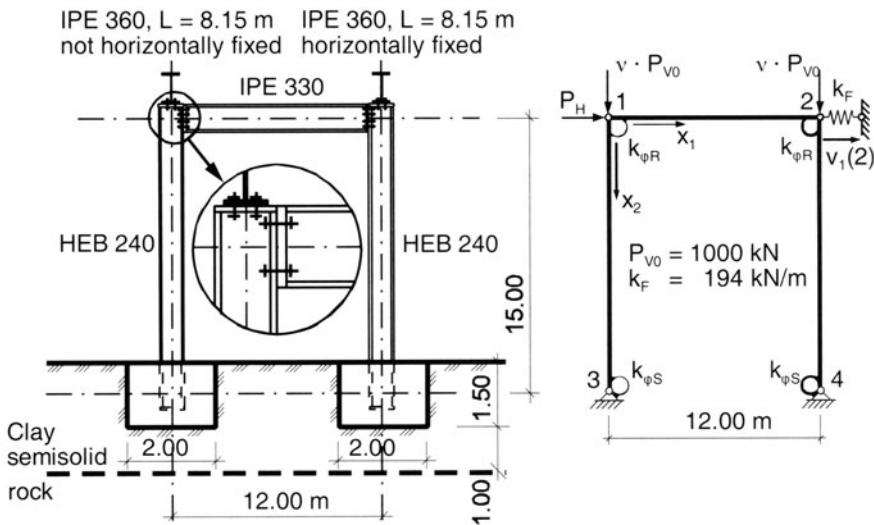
Plane frame consisting of rolled steel shapes; construction sketch, statical system, and loading
